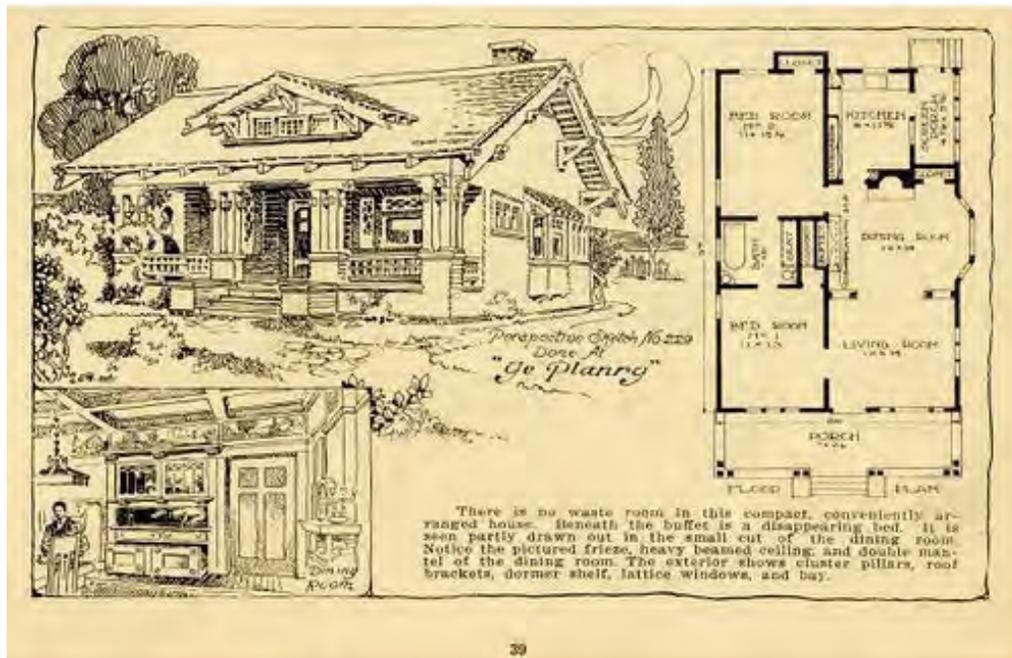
"Ye Planry" Catalogue from 1908 showing floorplan identical to 2226 Seventh Street
